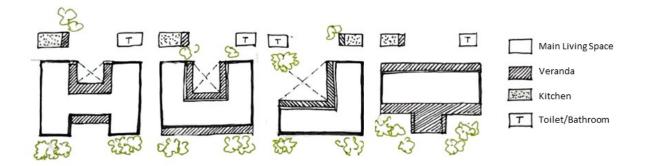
Sketch showing the common layouts of Traditional Assam-type houses. (Source: Sketch developed by author based on figures from Housing Report- Assam Type House ⁴ and case study observations)
